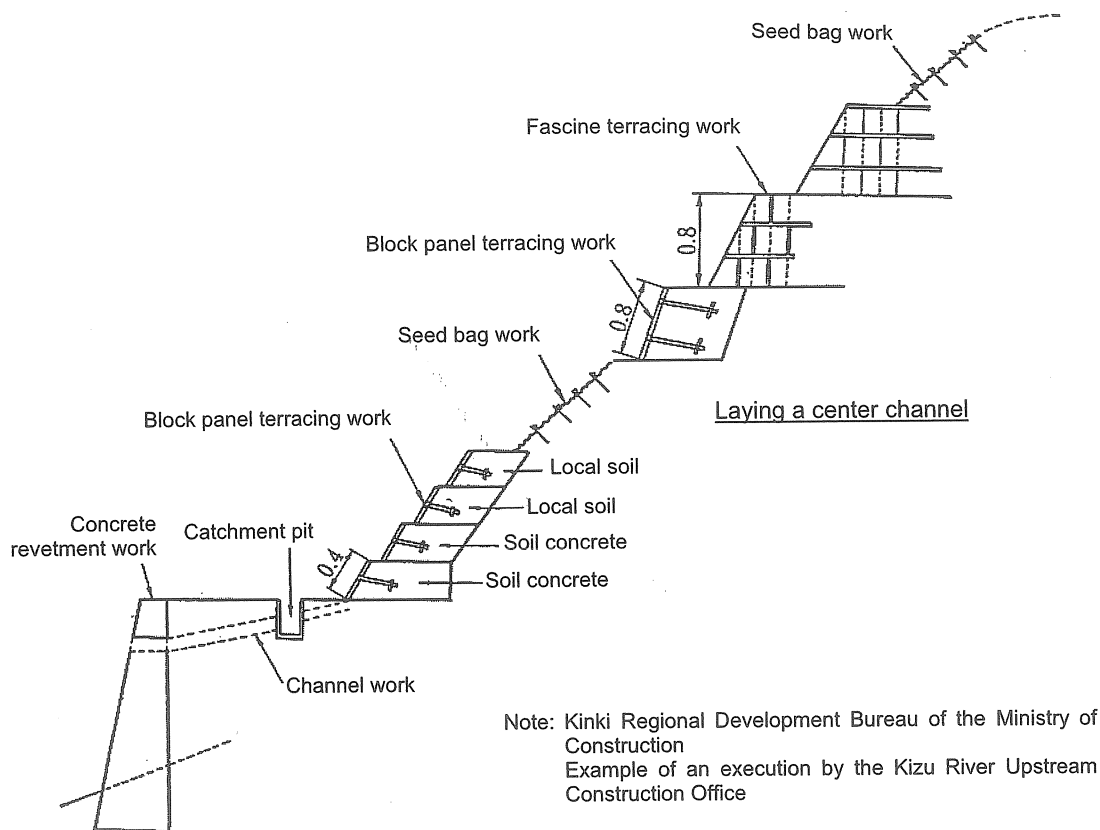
Sectional Diagram of Collapsed Ground (Sample Execution) (unit: m)
